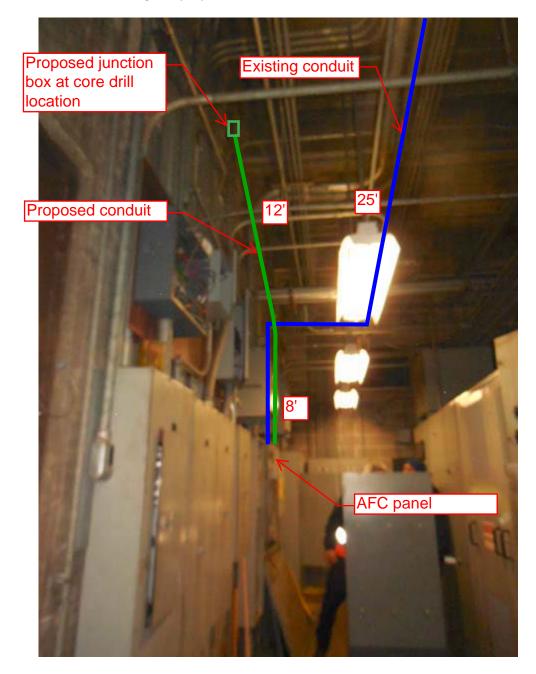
Existing and proposed conduits to AFC Panel in AC Switchboard Room 107
